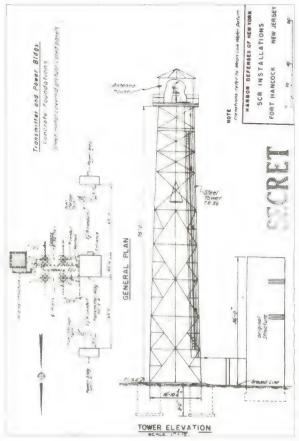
Elevation of SCR-296 radar installation, 1943. The Army constructed a new tower approximately a quarter mile south of the Signal Corps' test facility. This tower housed a SCR-296 radar unit that sent target information to the rapid fire guns at Battery Gunnison (Report of Completed Works, CDSG ePress).
